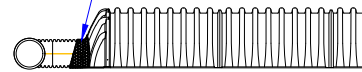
HEADER WITH SAME SIZE MANIFOLD STUB INTO END CAP.
